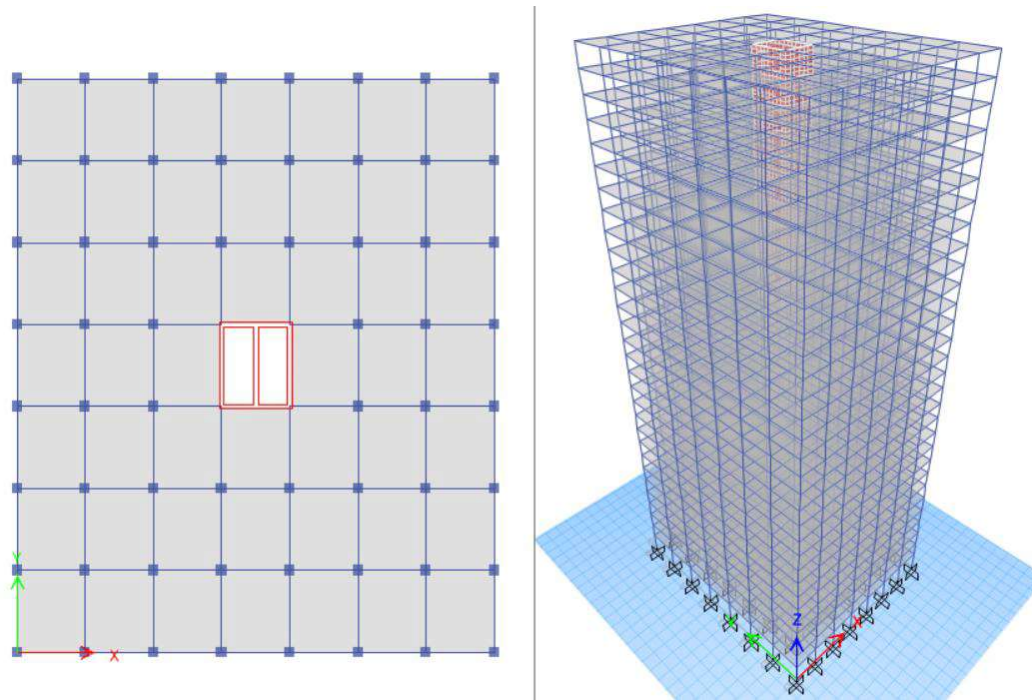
7 Structural Plan and Elevation Views of Case III Model
